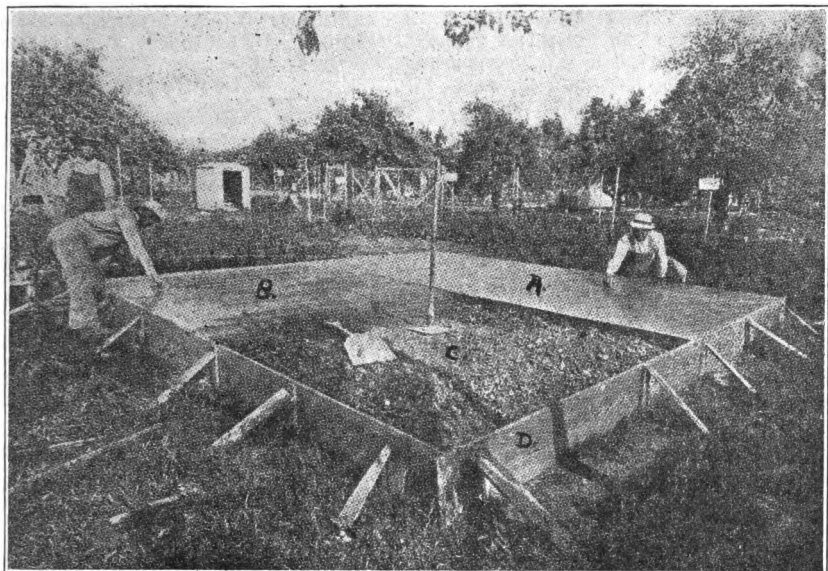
D shows the form which has been built to retain the concrete and filler. C shows the cinders and rocks which are used as fillers and for drainage beneath the floor. B is the 3 inches of concrete which forms the body of the floor. This concrete may be leveled down with a 16-ft. straight edge or a 16-ft. 2x4 by dragging it along on the edge of your forms. A. This is the thin finish coat of pure cement and water mixed, and is troweled down perfectly smooth.
